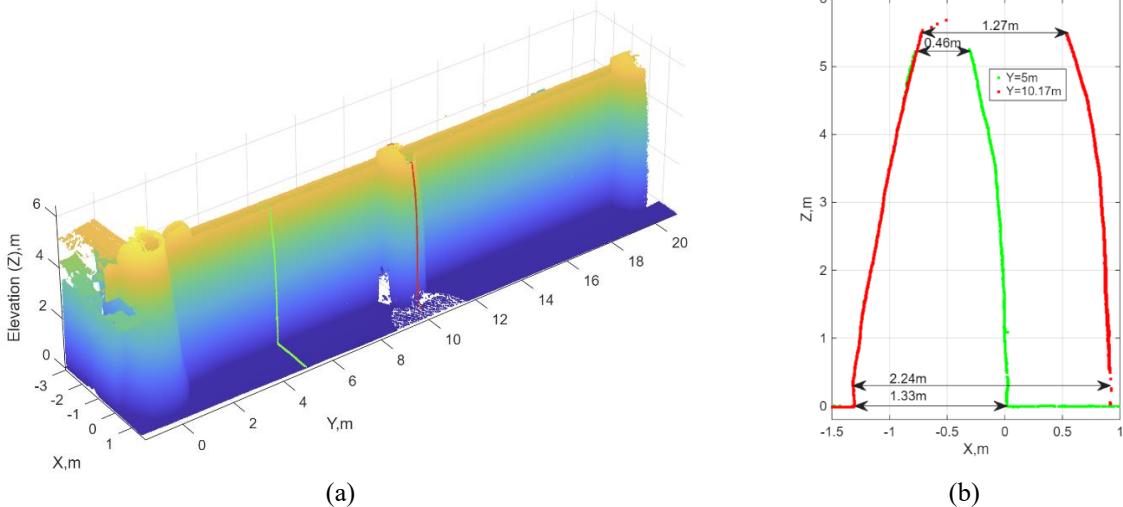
Two vertical sections of the monument's front wall on the right side of the main entrance (a), and elevation views of the sections (b)
